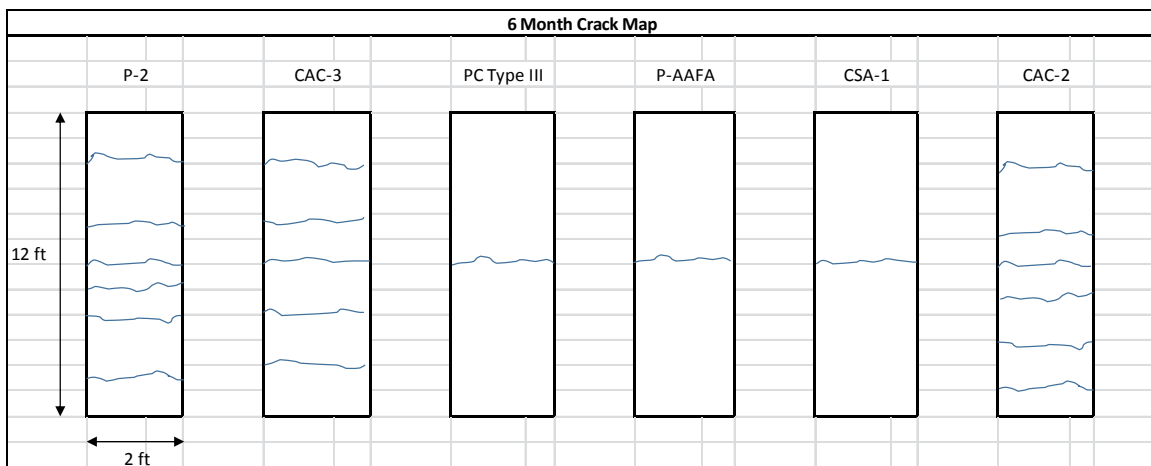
Crack Map of Bridge Deck Repairs
